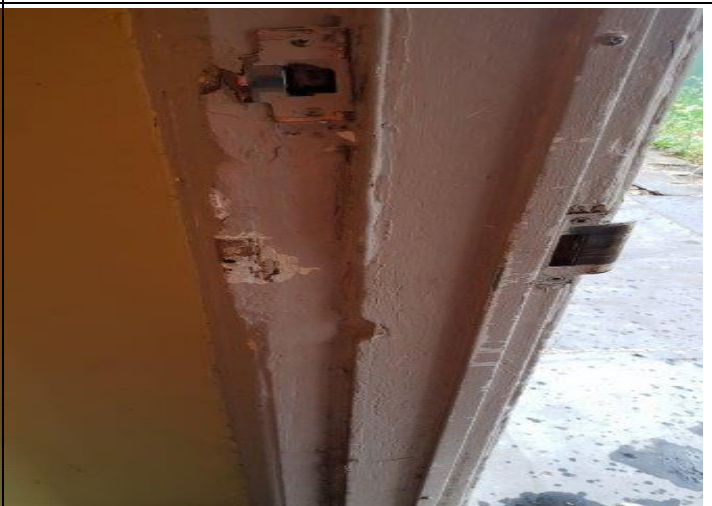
59 Cowper Street, Dwelling - Interior, Timber door frames, lead containing white paint (WSP-104435).
